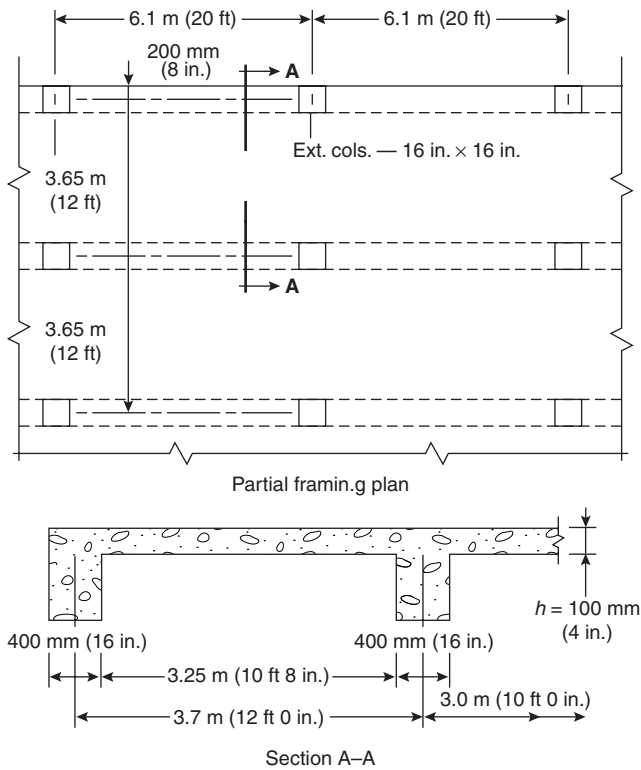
One-way continuous slab, supported on beams.⁴
